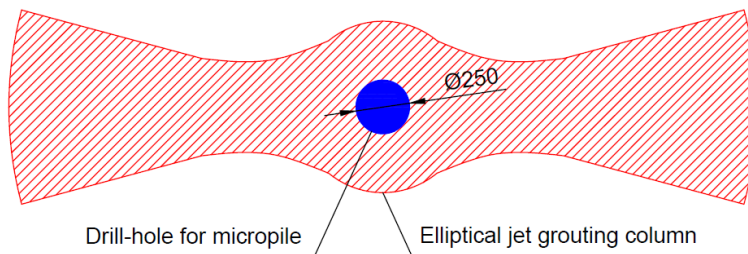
Scheme of rebar installation within elliptical jet grouting column.
